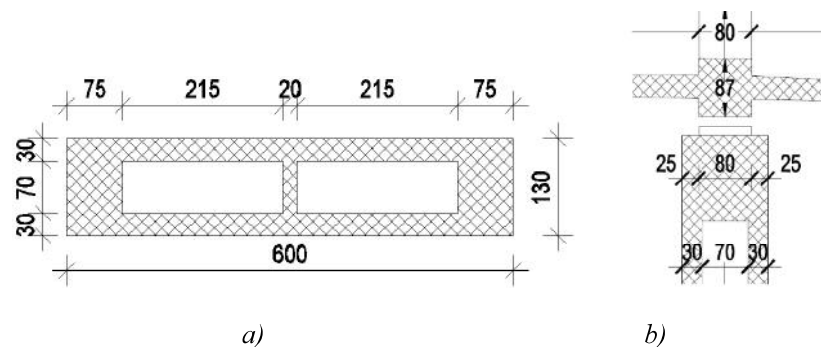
Cross section of a) piers and b) pier with the cap beam
